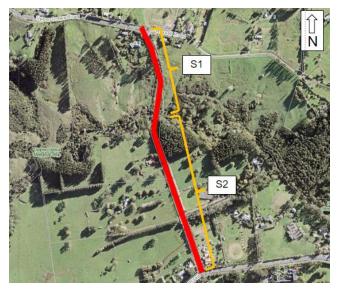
Widening recommendation of Upper Örewa Road – Hybrid approach
